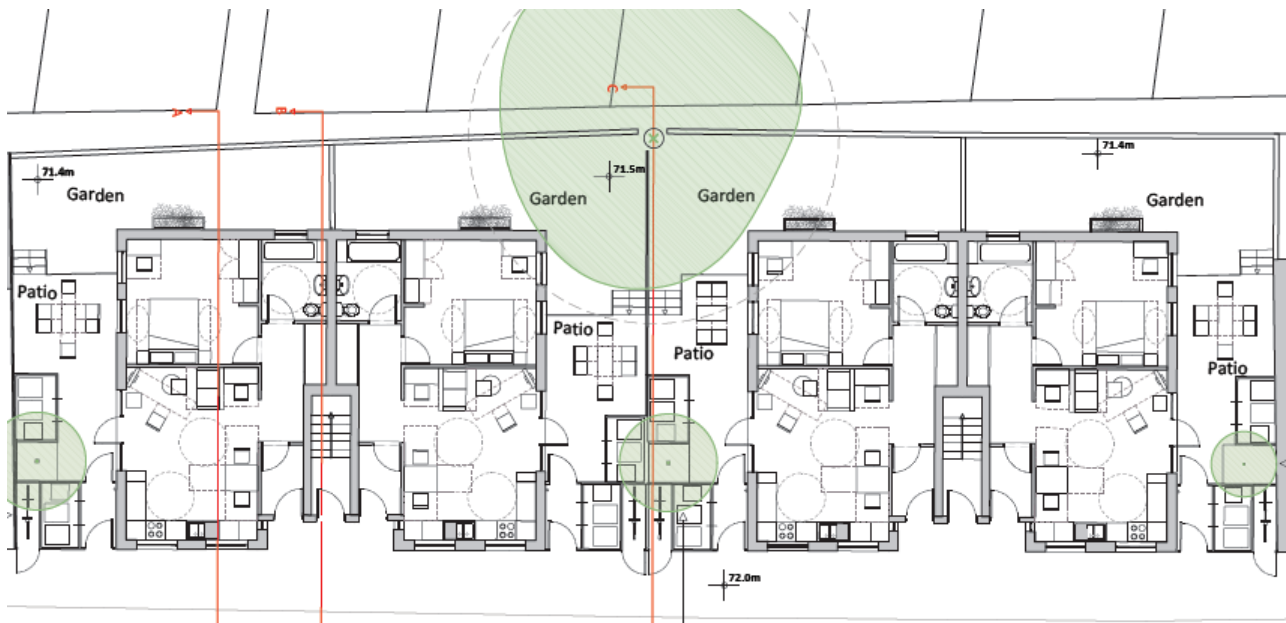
Refused site plan for planning application 16/00018/FUL.
